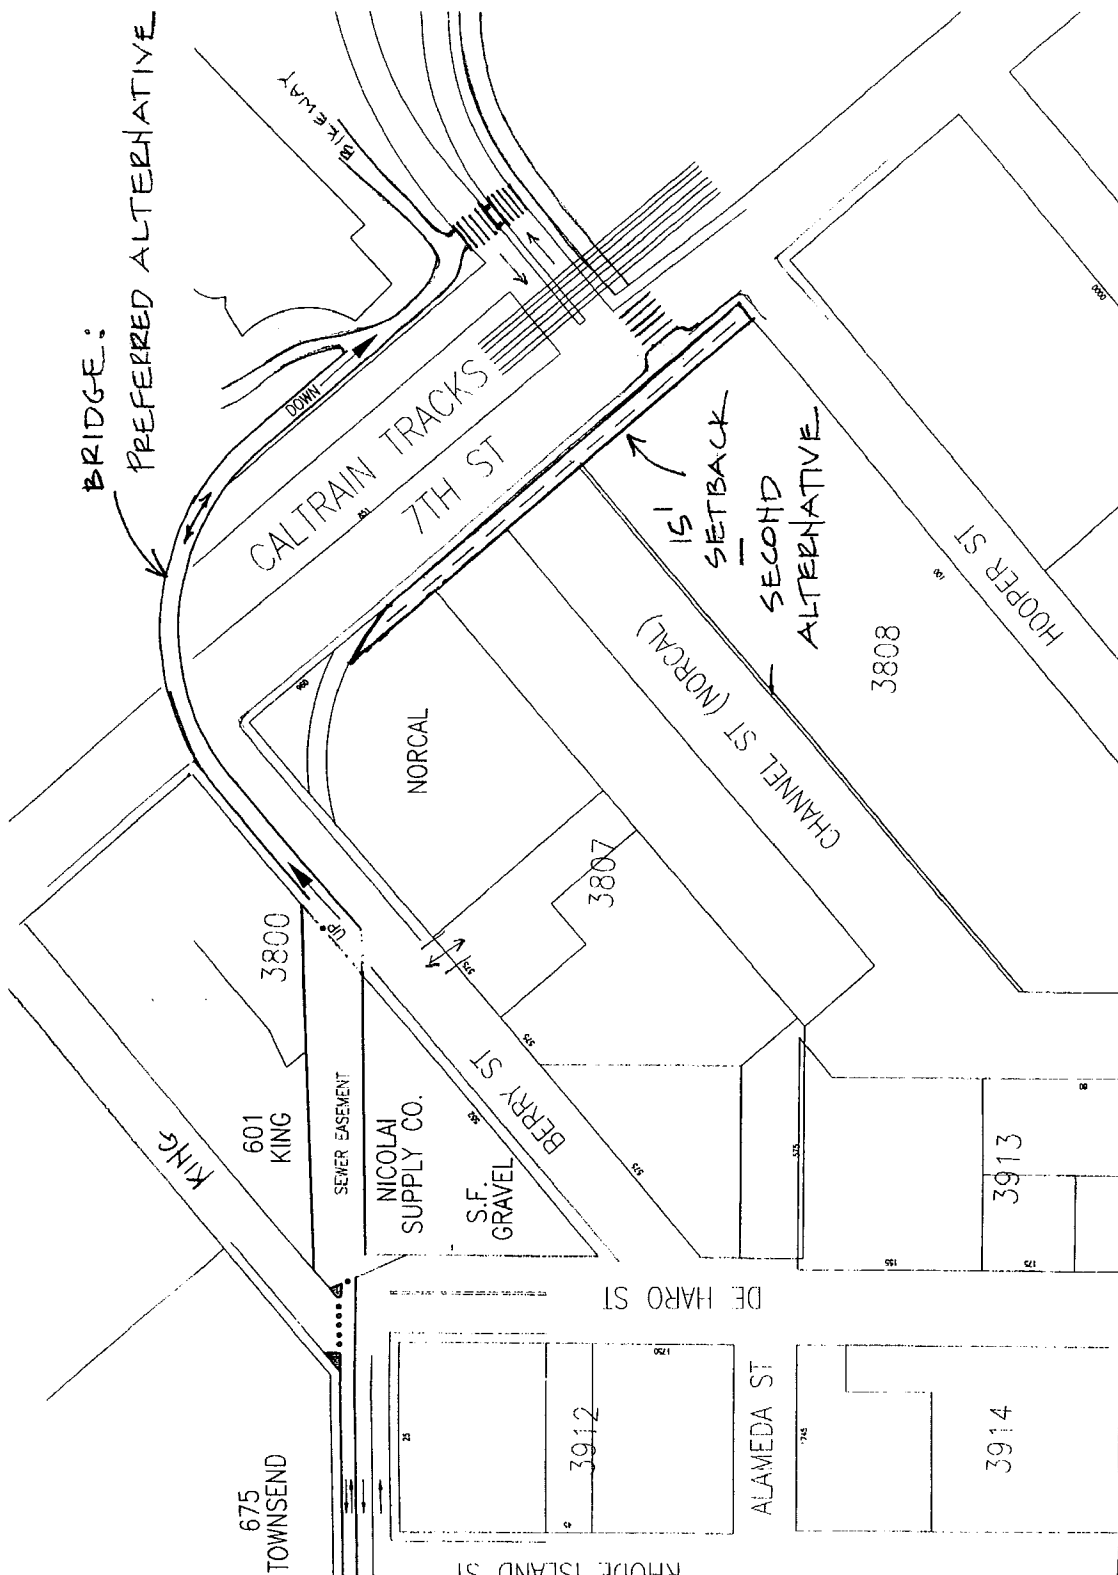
Crossing to Mission Bay Alternatives #1: bridge and Alternative #2: bikeway along 7<sup>th</sup> St. to Commons Crossing
